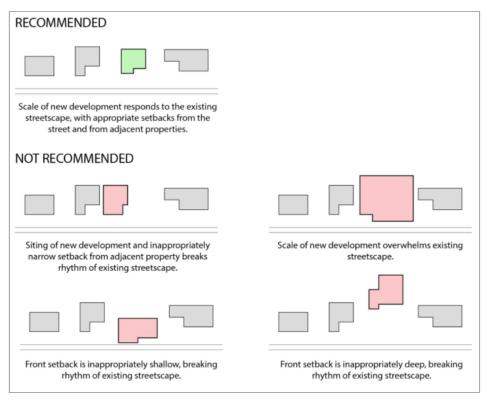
Guidelines for sitting new development within the existing streetscape (Source: First and Second Street HCD Plan)
